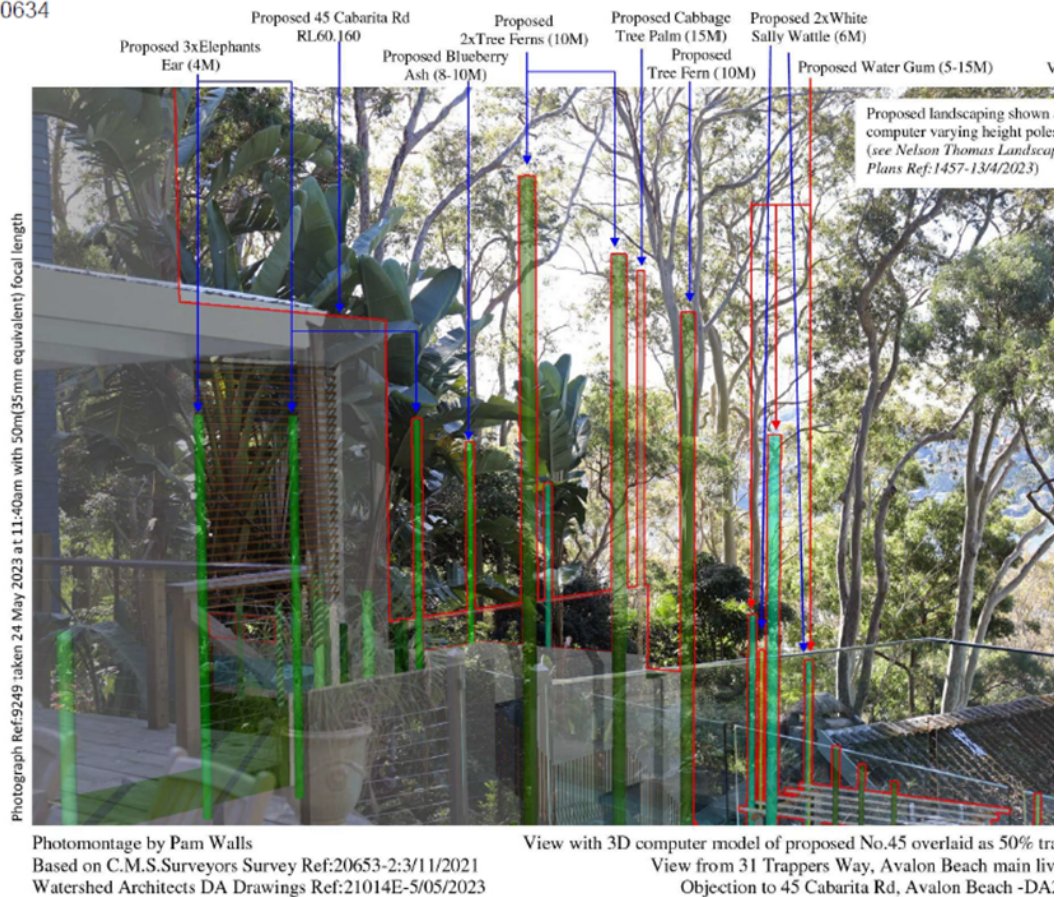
Extract from submission from 49 Cabarita Road showing impact of vegetation proposed on original landscape plan.
